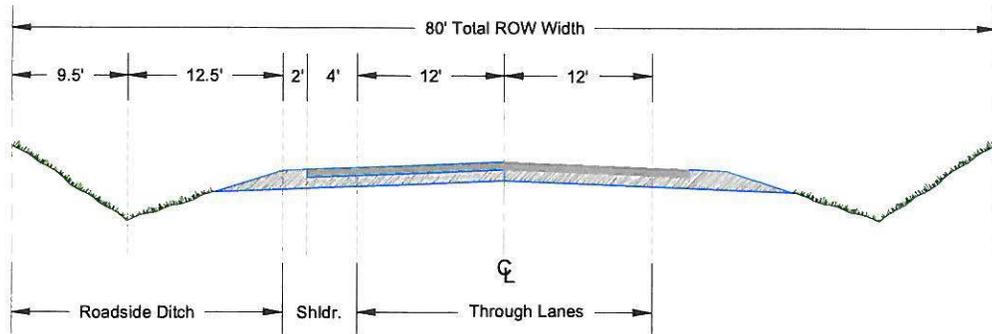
Typical Rural Minor Arterial Partial Cross Section
